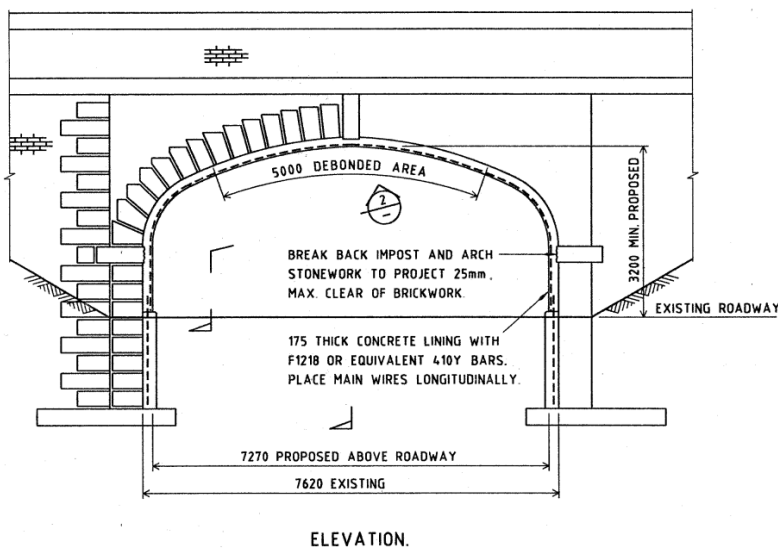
Fryerstown arch bridge – Concrete lining (August 1990)
